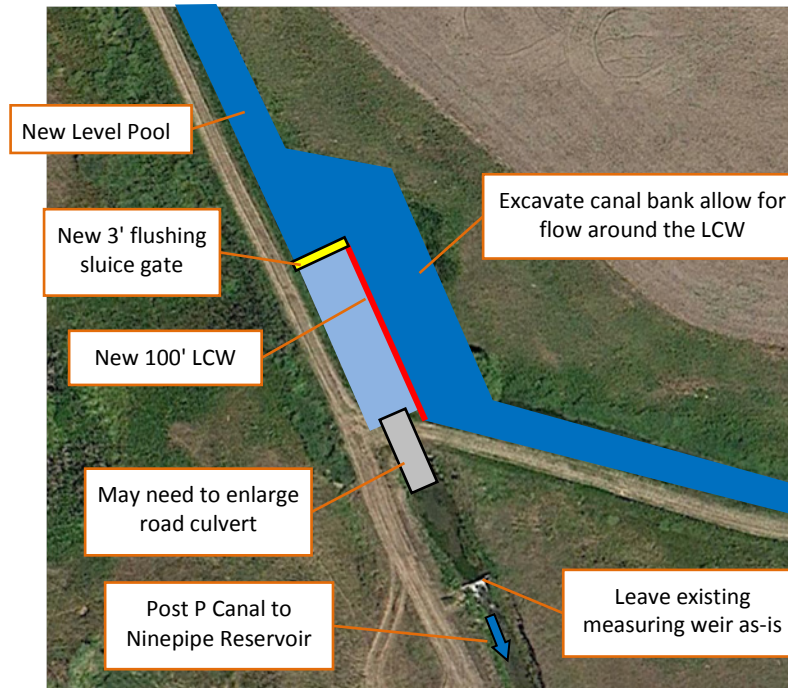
Conceptual plan view of new LCW structure in the Post A Canal (not to scale)
